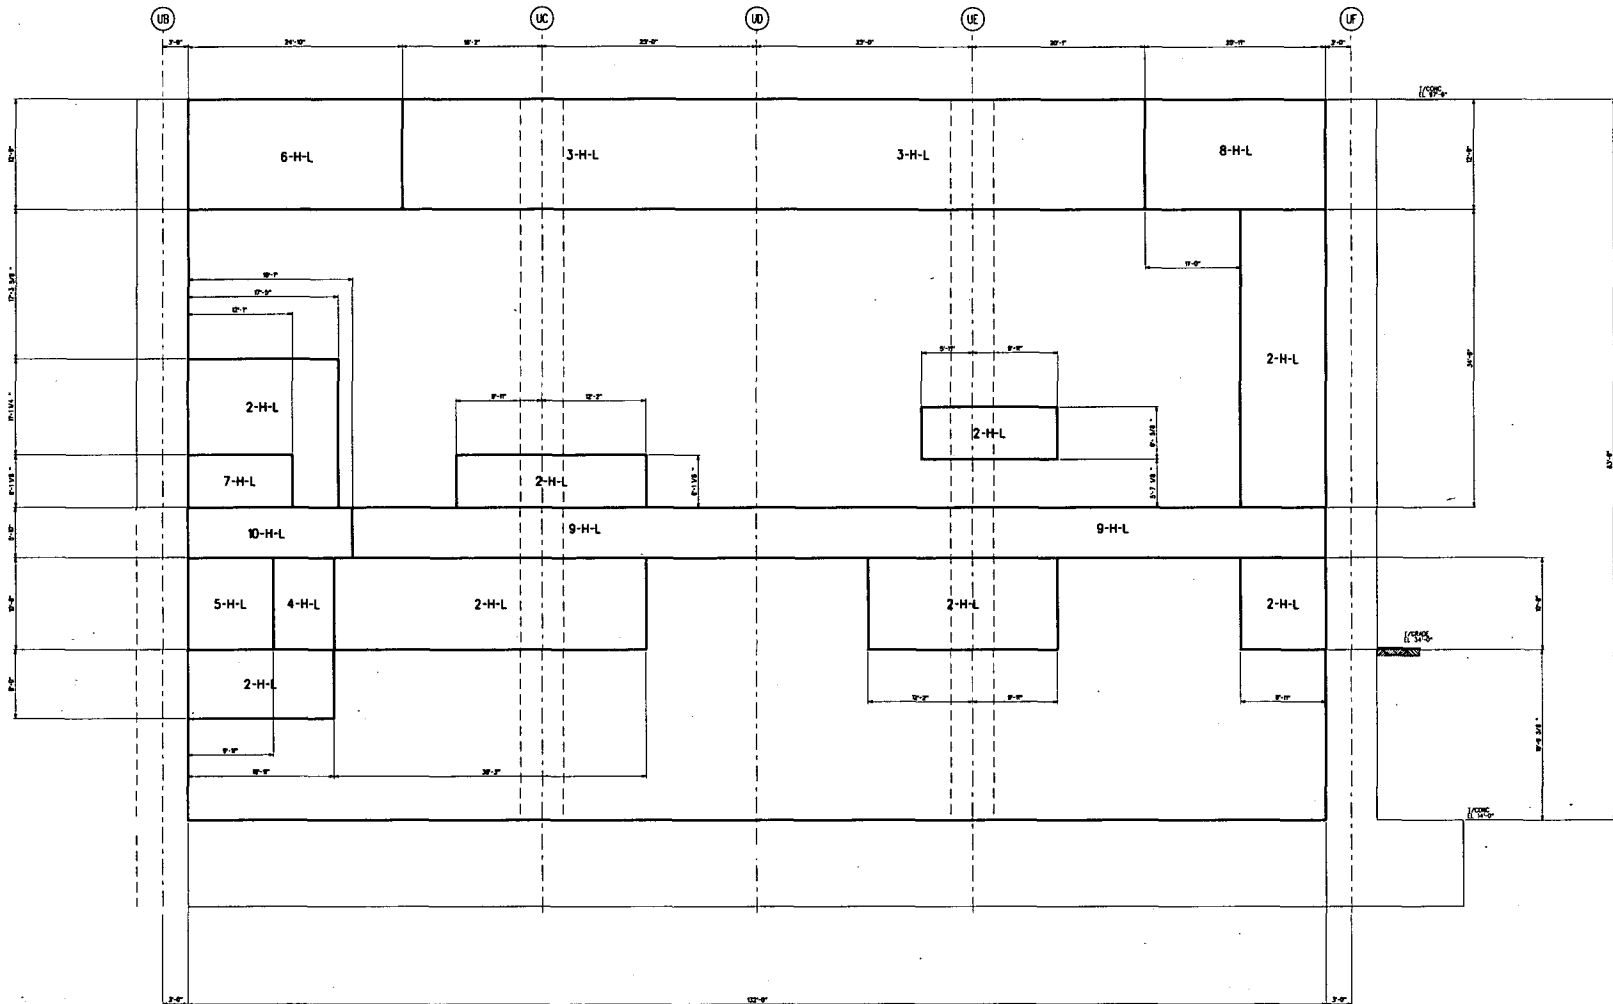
H.6-97: BASIN WEST WALL LOOKING EAST
